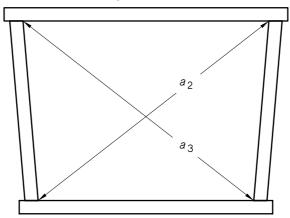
(3) TOLERANCE ON SHAPE OF A BOX SECTION
